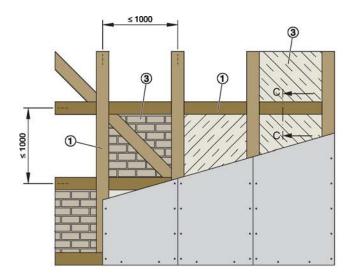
Lightweight partition wall with timber support structure and cladding on one side
